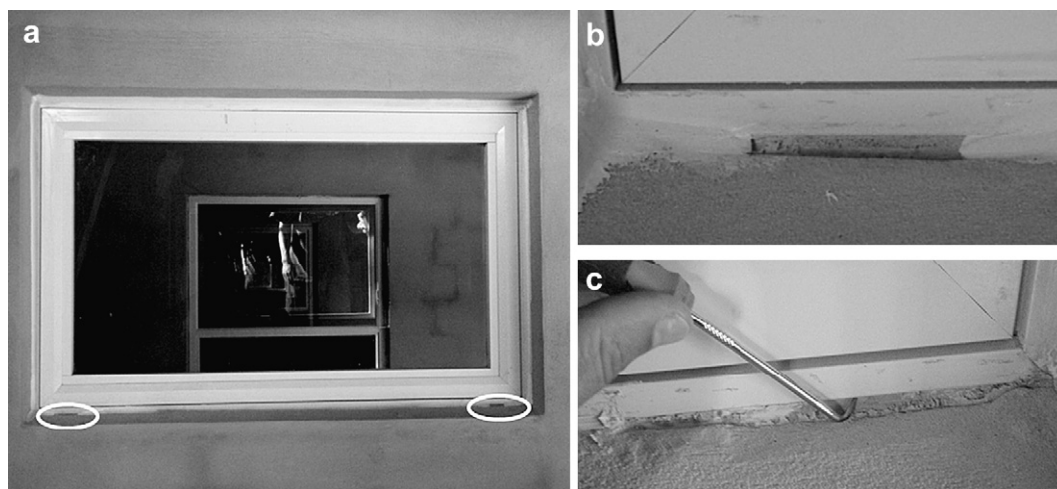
Drainage channels in exterior moisture barrier wall systems. (a) Location of drainage channels in CMU wall specimens with windows installed using a drainage method window installation. (b) Inability to seal the drainage channel creates an inconsistency in the exterior moisture barrier of the wall which could allow intruding water to penetrate behind the wall cladding. (c) The window of test specimen 035 was installed so tightly against the bucking that the drainage channels were constricted.
